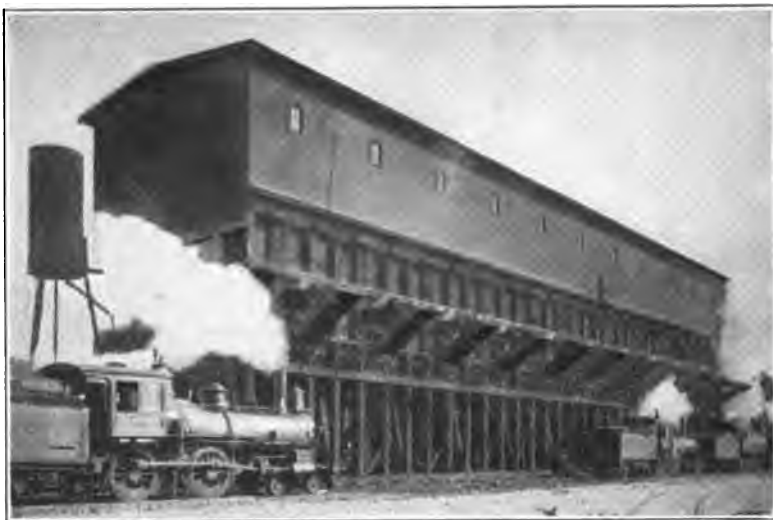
Coaling plant at Chicago—Chicago & North-Western.
